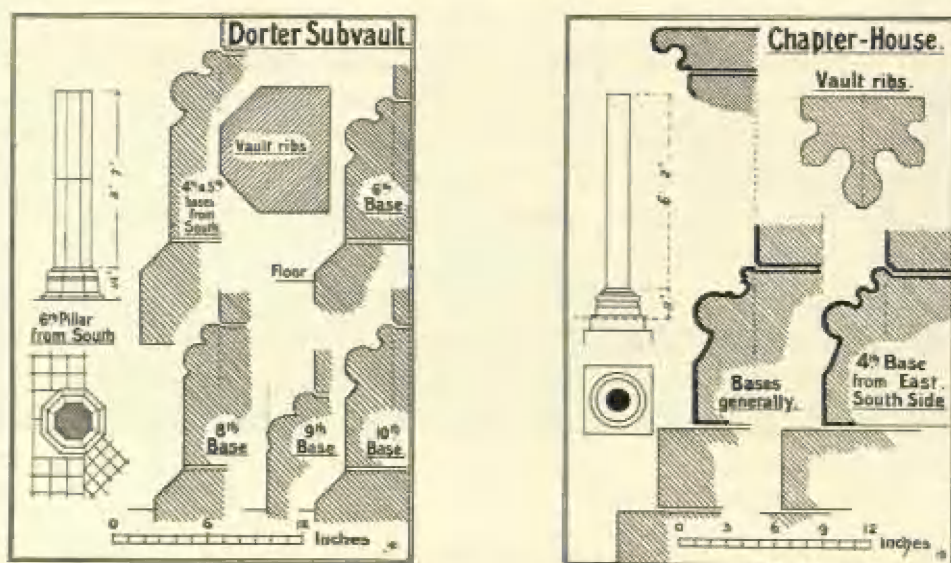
Architectural details of the chapter-house and dorter subvault.
